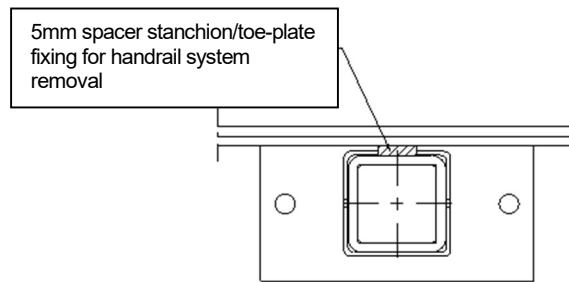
5mm spacer stanchion/toe-plate fixing for handrail system removal
